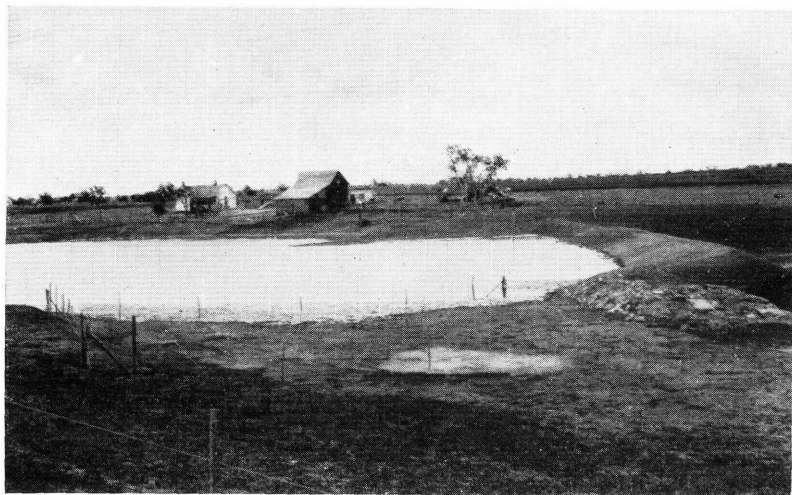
An earth dam with a side spillway. The dam and spillway have been fenced to keep out livestock. This stock pond receives drainage from the barnyard, which is not desirable.
